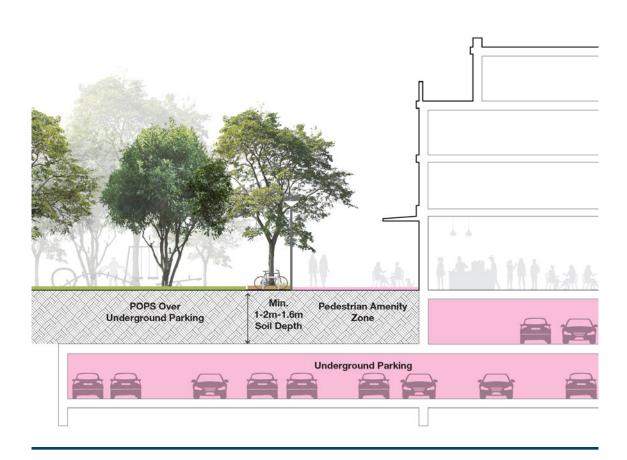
Underground parking facilities may be located within the subject site and below amenity spaces and POPS.
